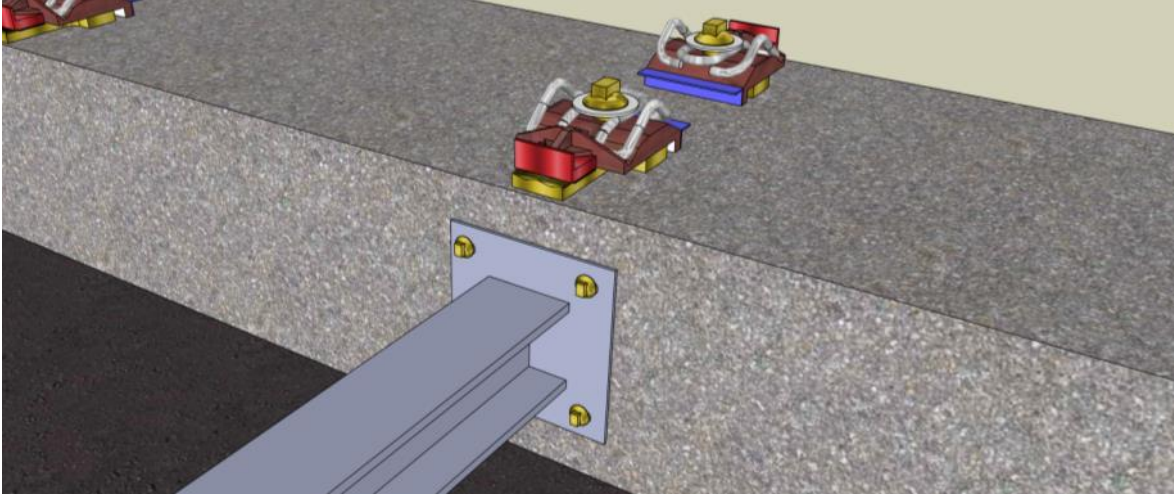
ANCHORING OF TRANSVERSAL BEAMS
